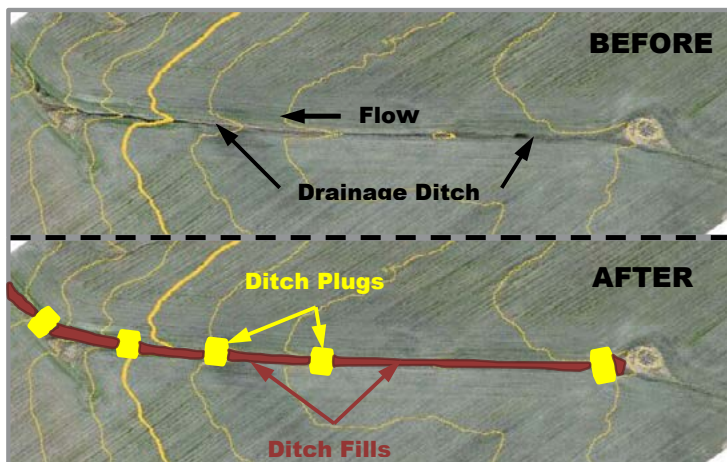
Ditch Plug/Fill Design for Sloped Wetland Setting – 2 Foot Contours
